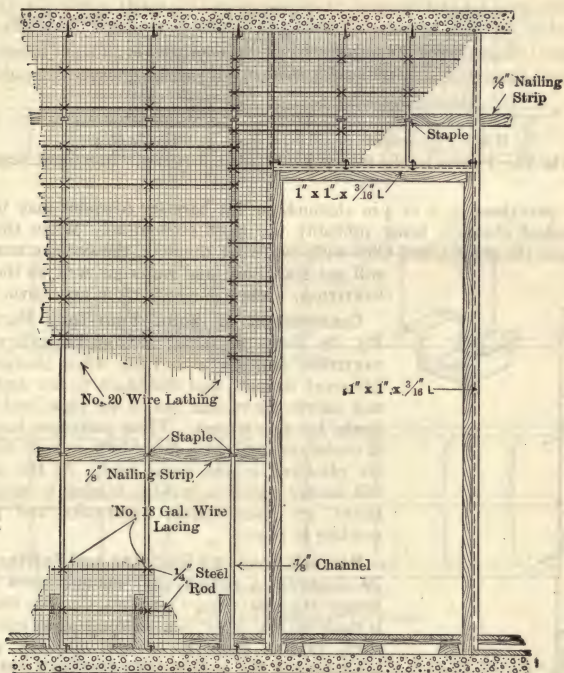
Two-inch Solid Plaster Partition. Elevation
